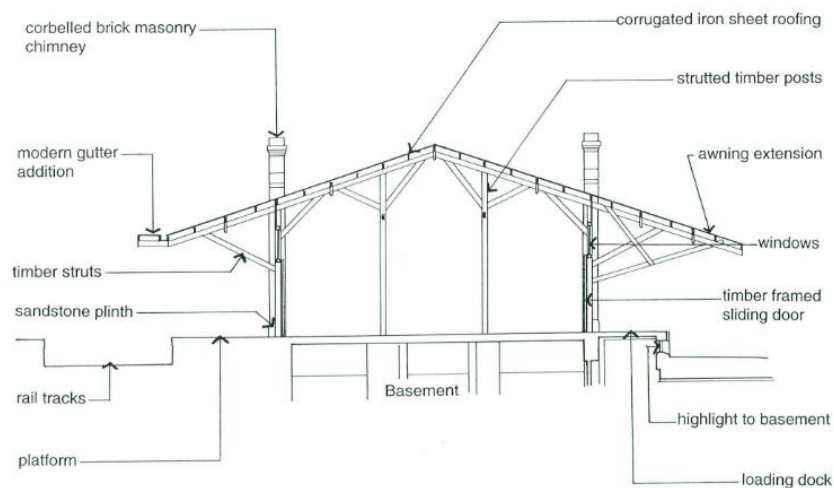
Typical Section Through Inwards Parcel Shed, Sydney Terminal²
